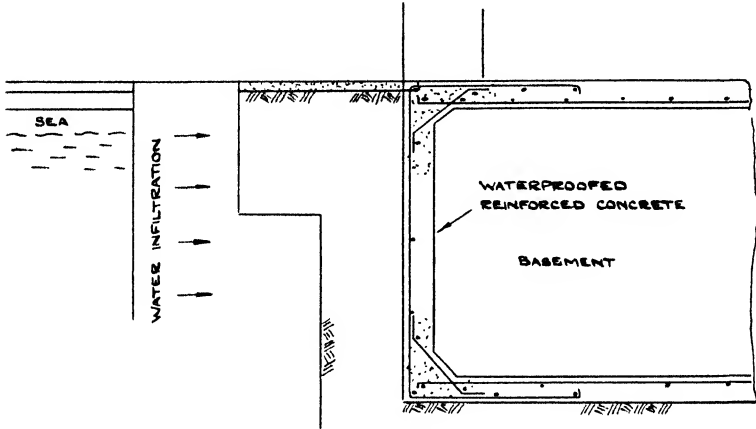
TYPICAL WATERPROOFED REINFORCED CONCRETE BASEMENT
